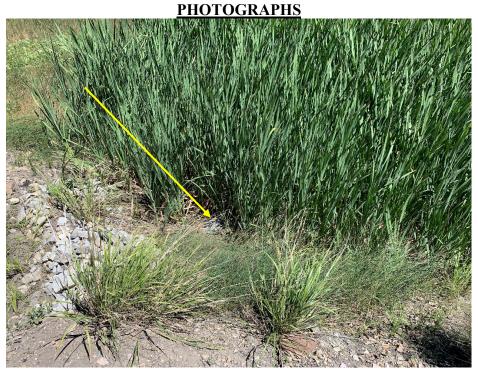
Cattails are blocking water flow at culvert discharge. Yellow arrow pointing at culvert.
